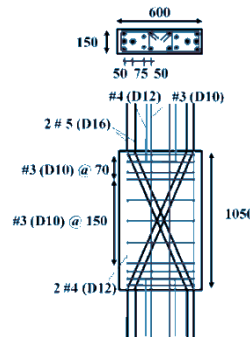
Reinforcing details of the CB175 (unit: mm)
